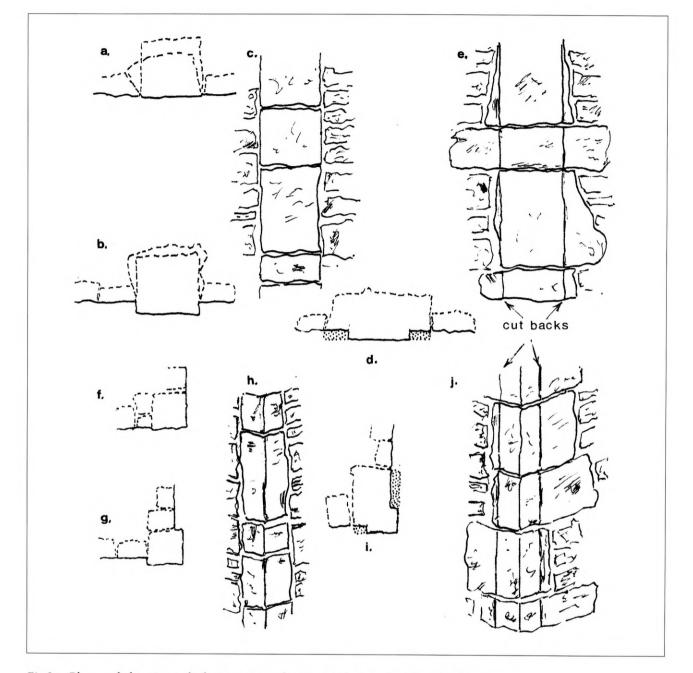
Plans and elevations of pilaster strips and quoins without and with cut backs:
